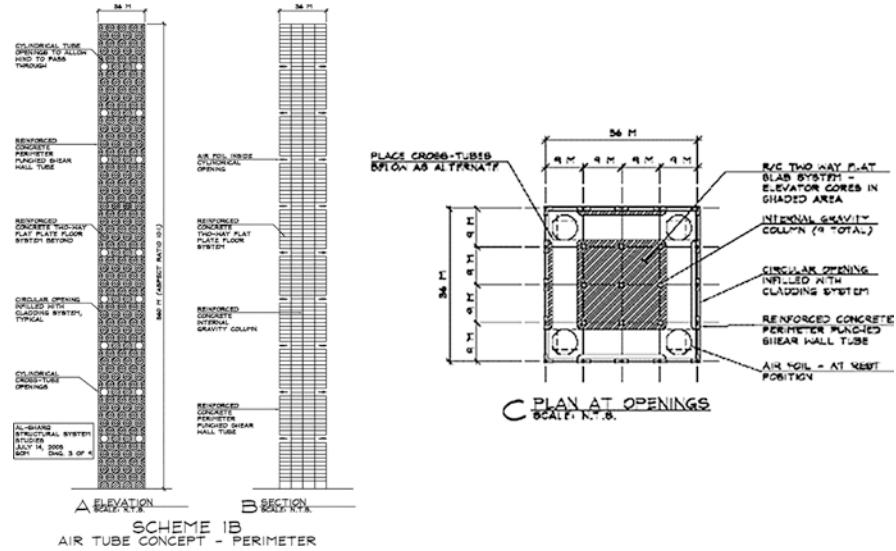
Concept for concrete tall buildings – circular holes in perimeter wall system
